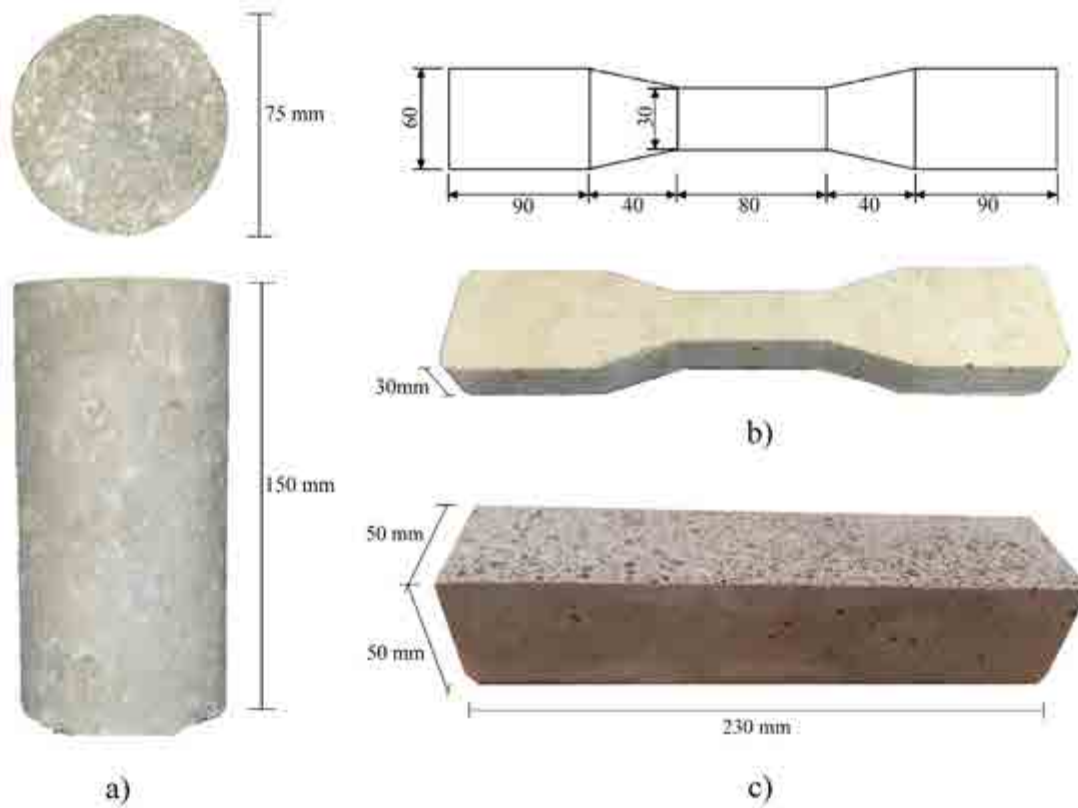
a) Compression specimen; b) Tensile specimen c) Flexure specimen.
